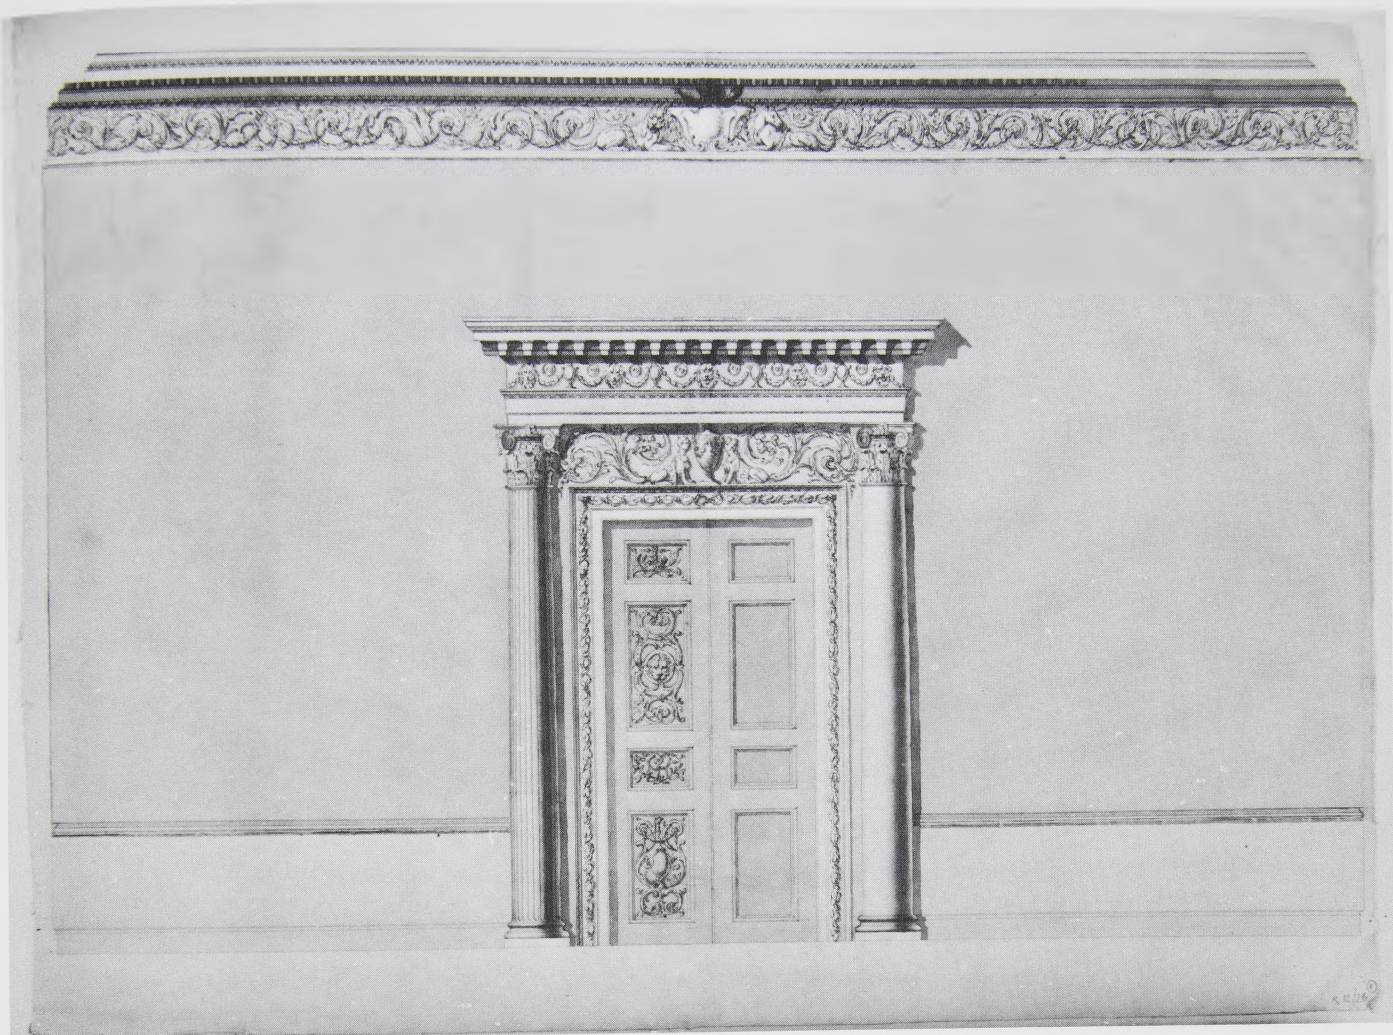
Robert Adam. London, Buckingham House: Design for a doorway and wall, c. 1762
